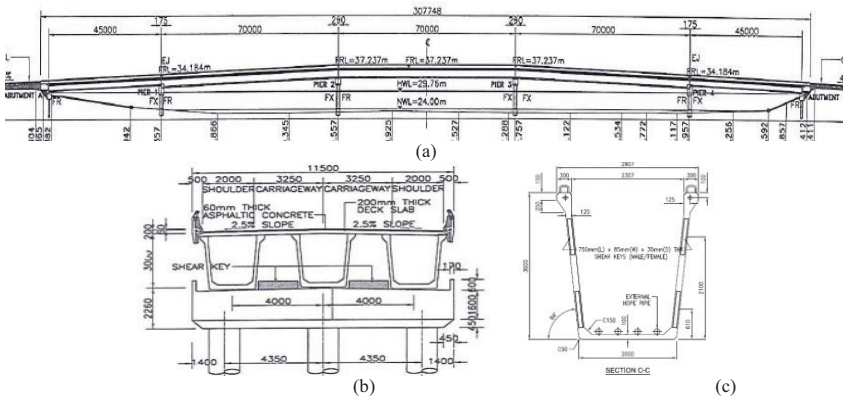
(a) Elevation view, (b) cross-section of Manong Bridge and (c) typical cross section of U-girder.
